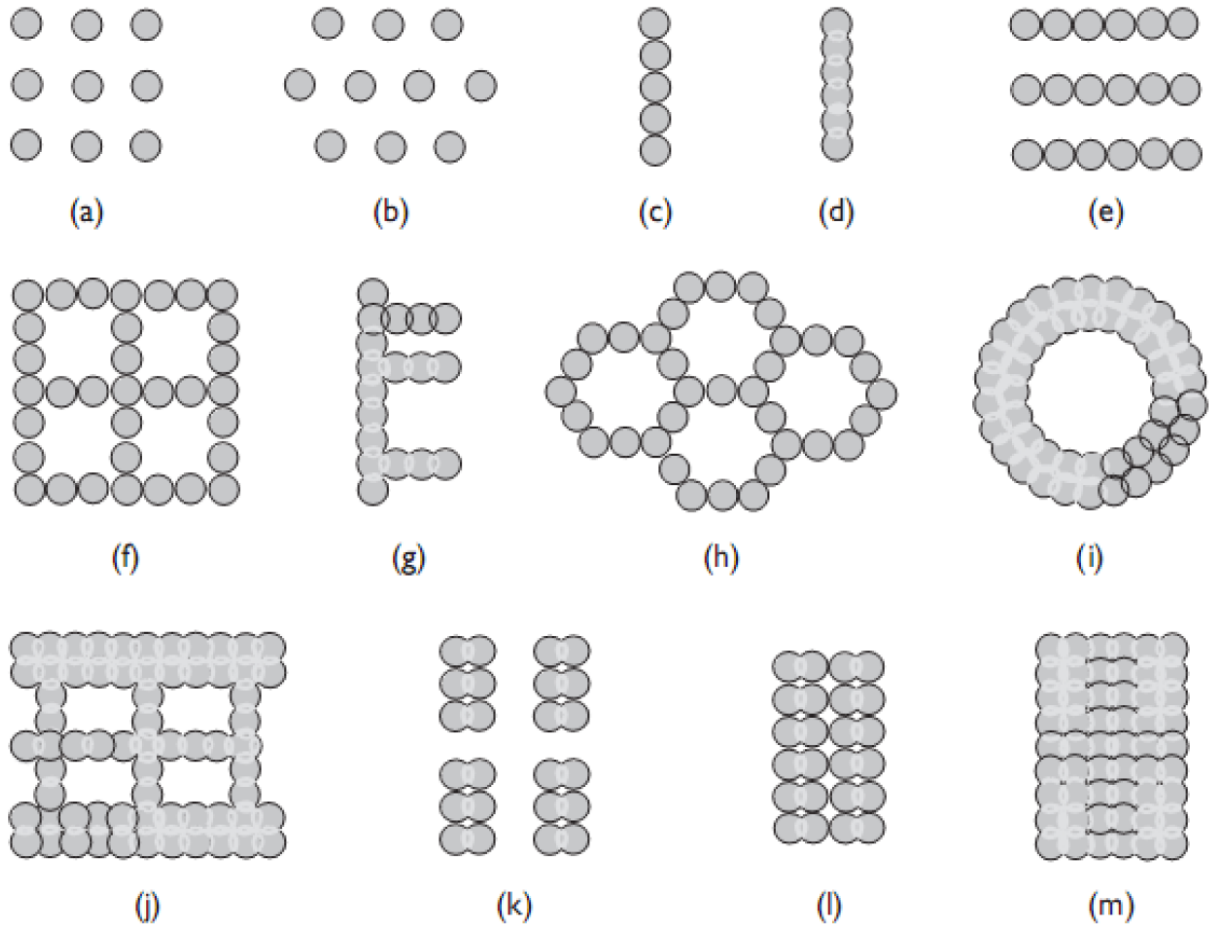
DSM column patterns: (a) square; (b) triangular; (c) tangent wall; (d) overlapped wall; (e) tangent walls; (f) tangent grid; (g) overlapped wall with buttresses; (h) tangent cells; (i) ring; (j) lattice; (k) group columns; (l) group columns in-contact; (m) block (Esmaili et al. 2013)
